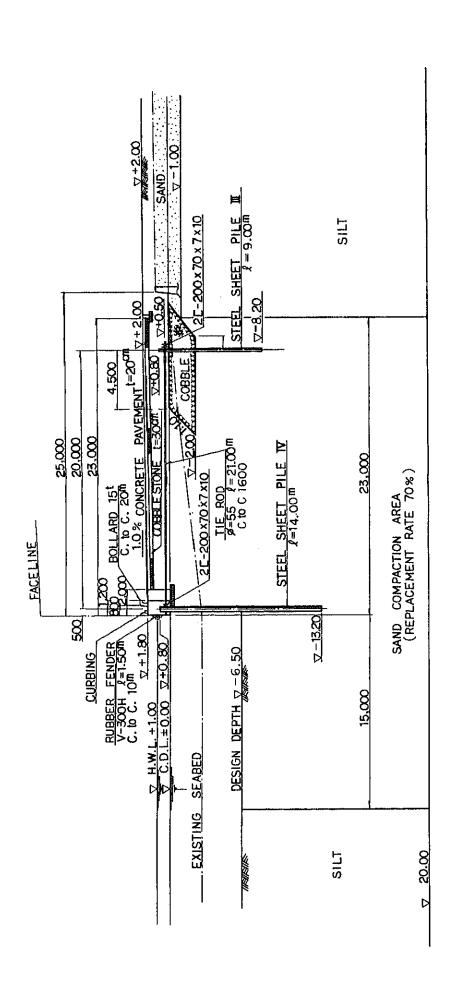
Design of Type-A (Steel Sheet Pile)
